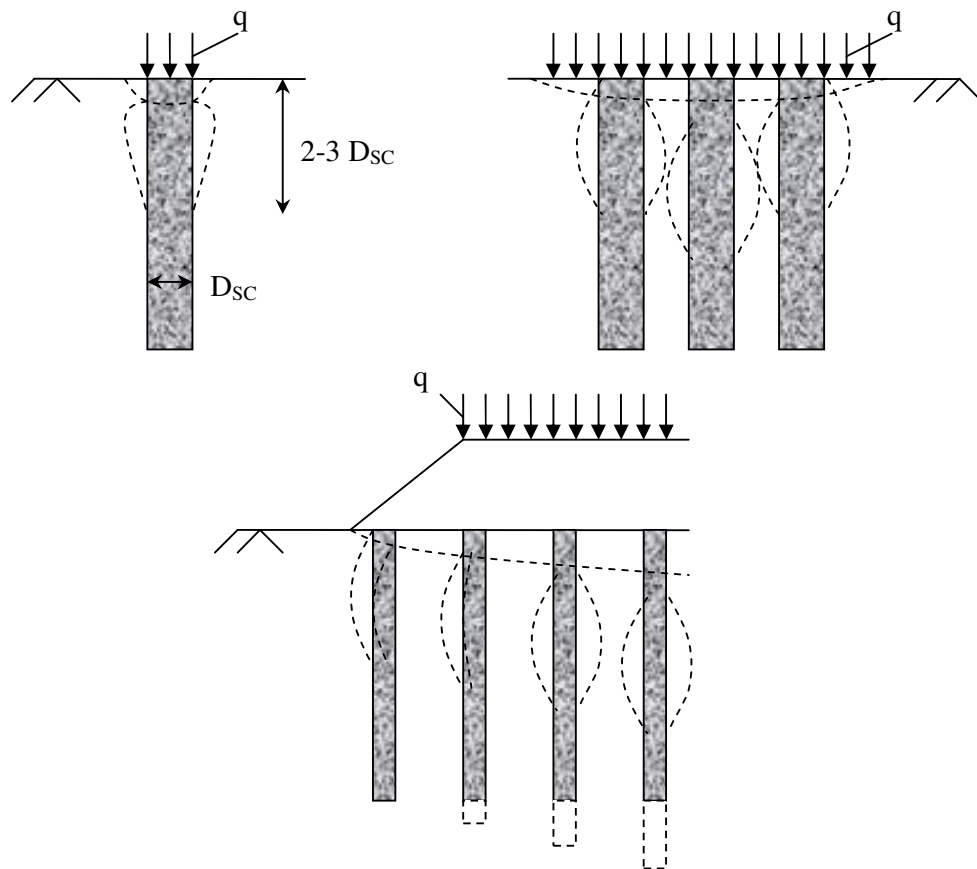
The bulging failure mechanism for stone columns under different foundation types (after: Kirsch, 2004).
